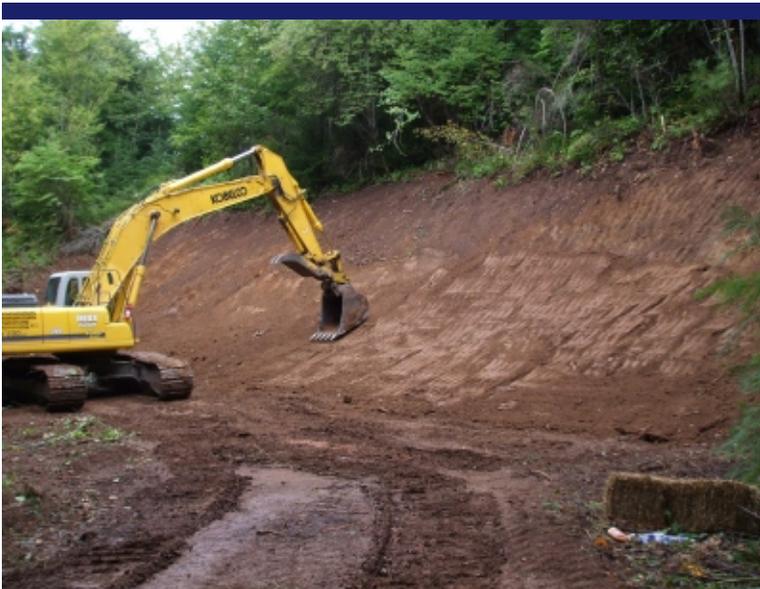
South of New Furnace - Slope reconstructon after fill material removal.
